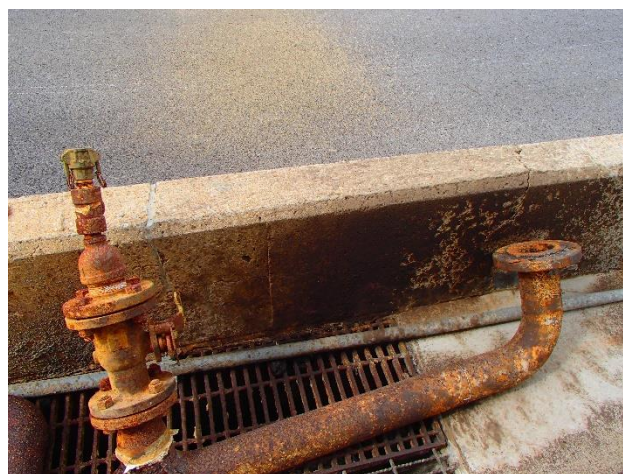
Cracks in secondary containment near Slurry Tank TK-5210.
